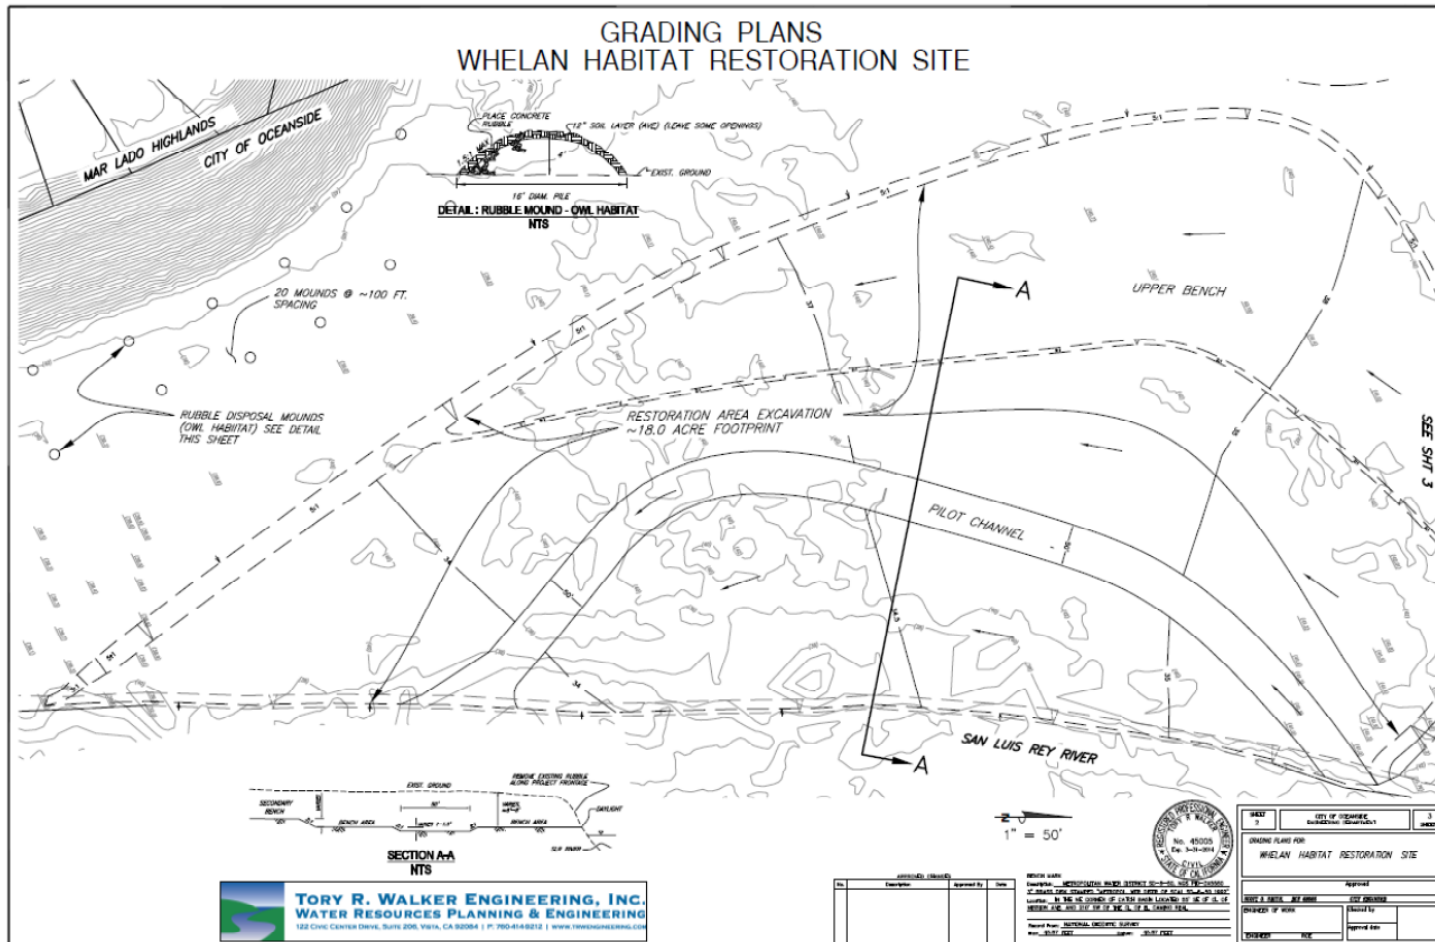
Proposed grading plan for the Channel Overbank Flooding Natural Scour Alternative
